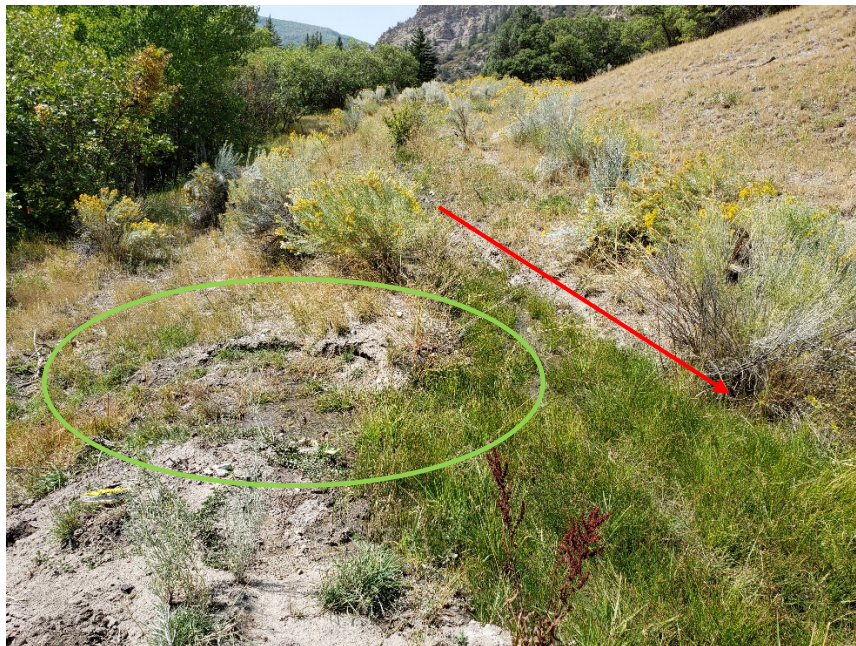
The breach (green oval) of a ditch (red arrow) leading from Pond 9 to the Refuse Pond required repair, which DRMS confirmed upon re-inspection on September 17, 2020.
